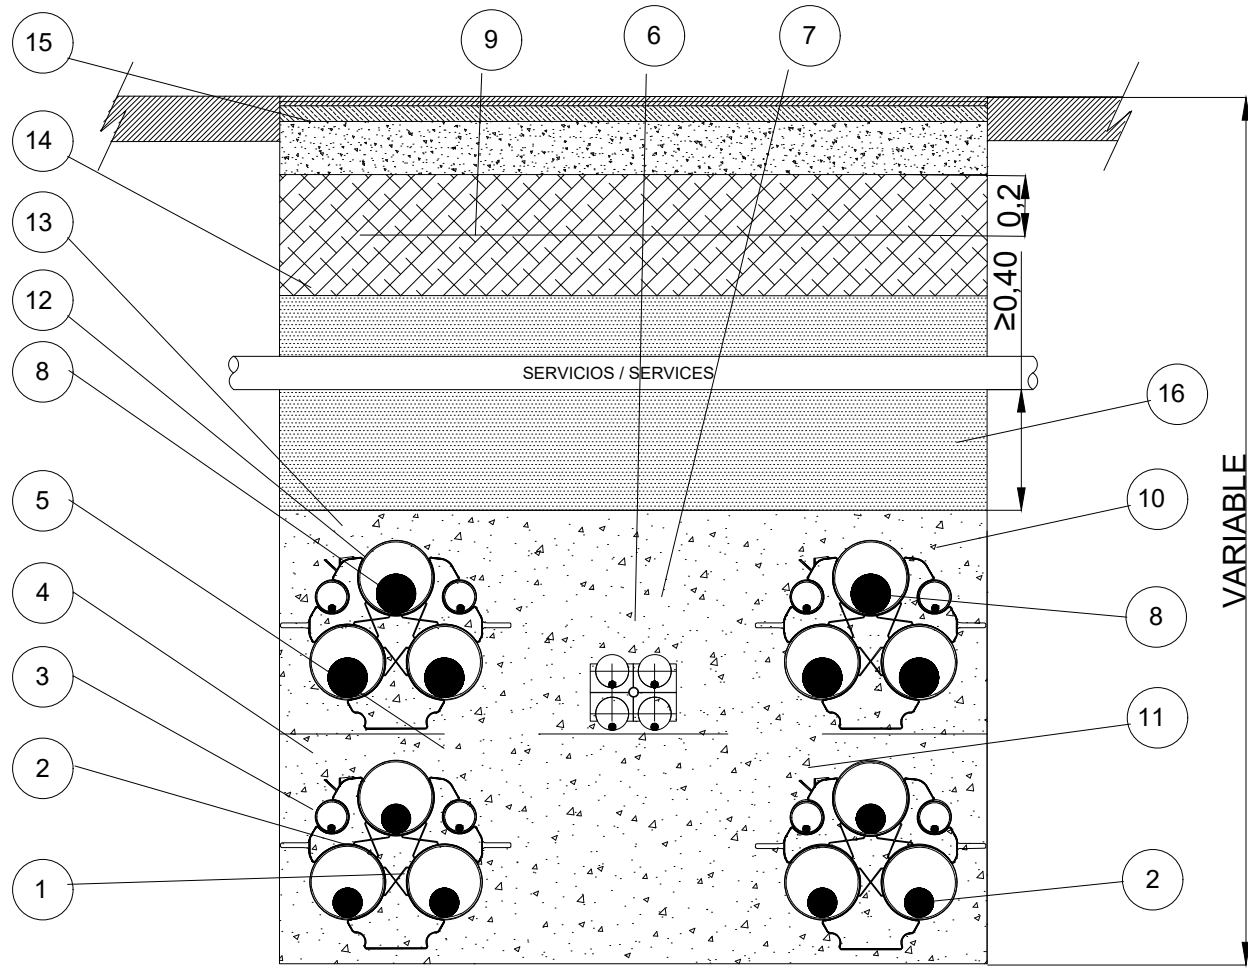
TYPICAL SECTION FOR PARALLEL SERVICES (ELECTRIC LINE) / DETALLE / 5 SECCIÓN TÍPICA PARA SERVICIOS PARALELOS (LÍNEA ELÉCTRICA)
